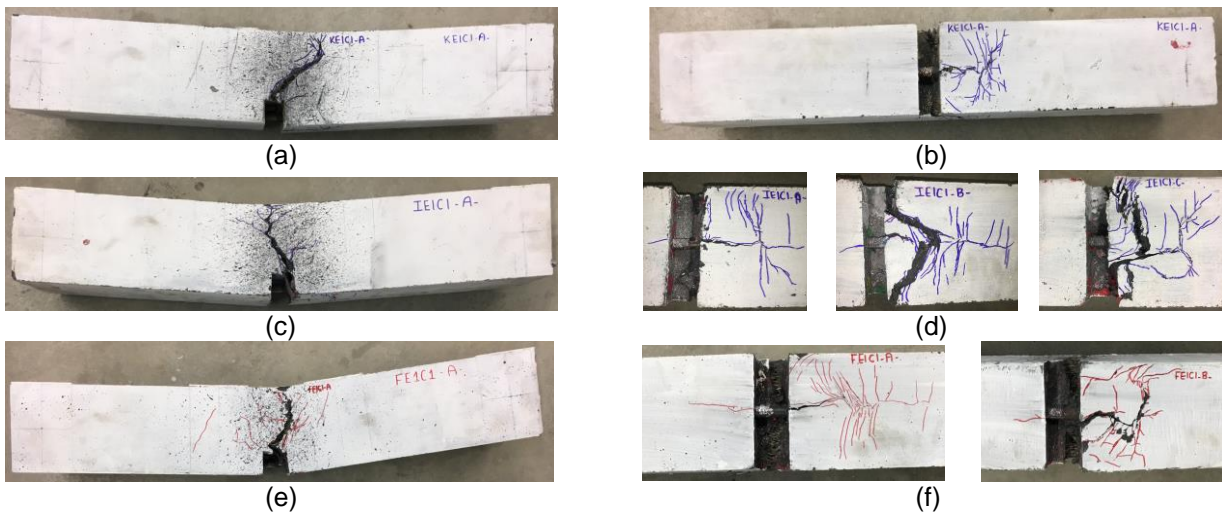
(a) Side face Com K at failure, (b) bottom face Com K at failure, (c) side face In-house at failure, (d) bottom faces In-house at failure, (e) side face Com F and (f) bottom faces Com F at failure
